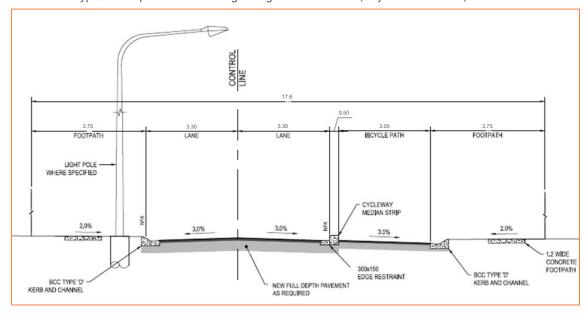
Possible Cross Section with no Parking and Separated Bicycle Facility (17.6 m)
